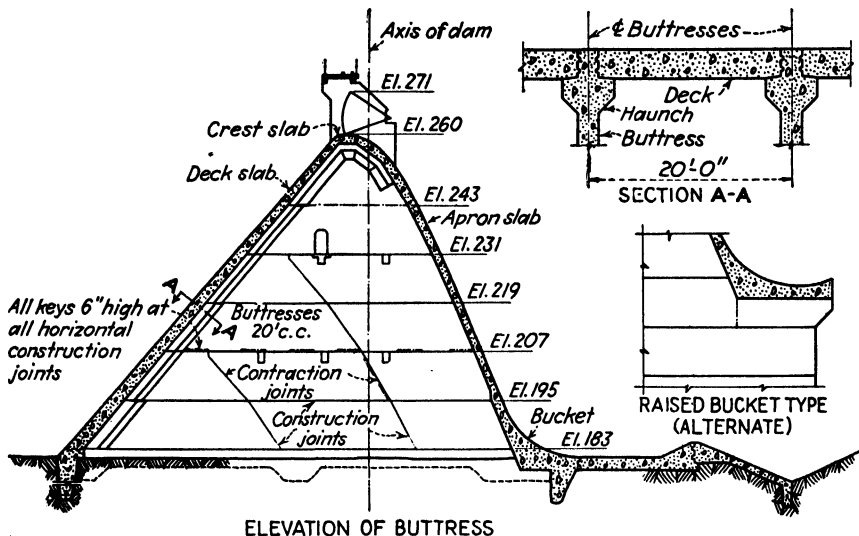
Minas Basin Dam, on shale. Spillway buttress elevation and deck section.
